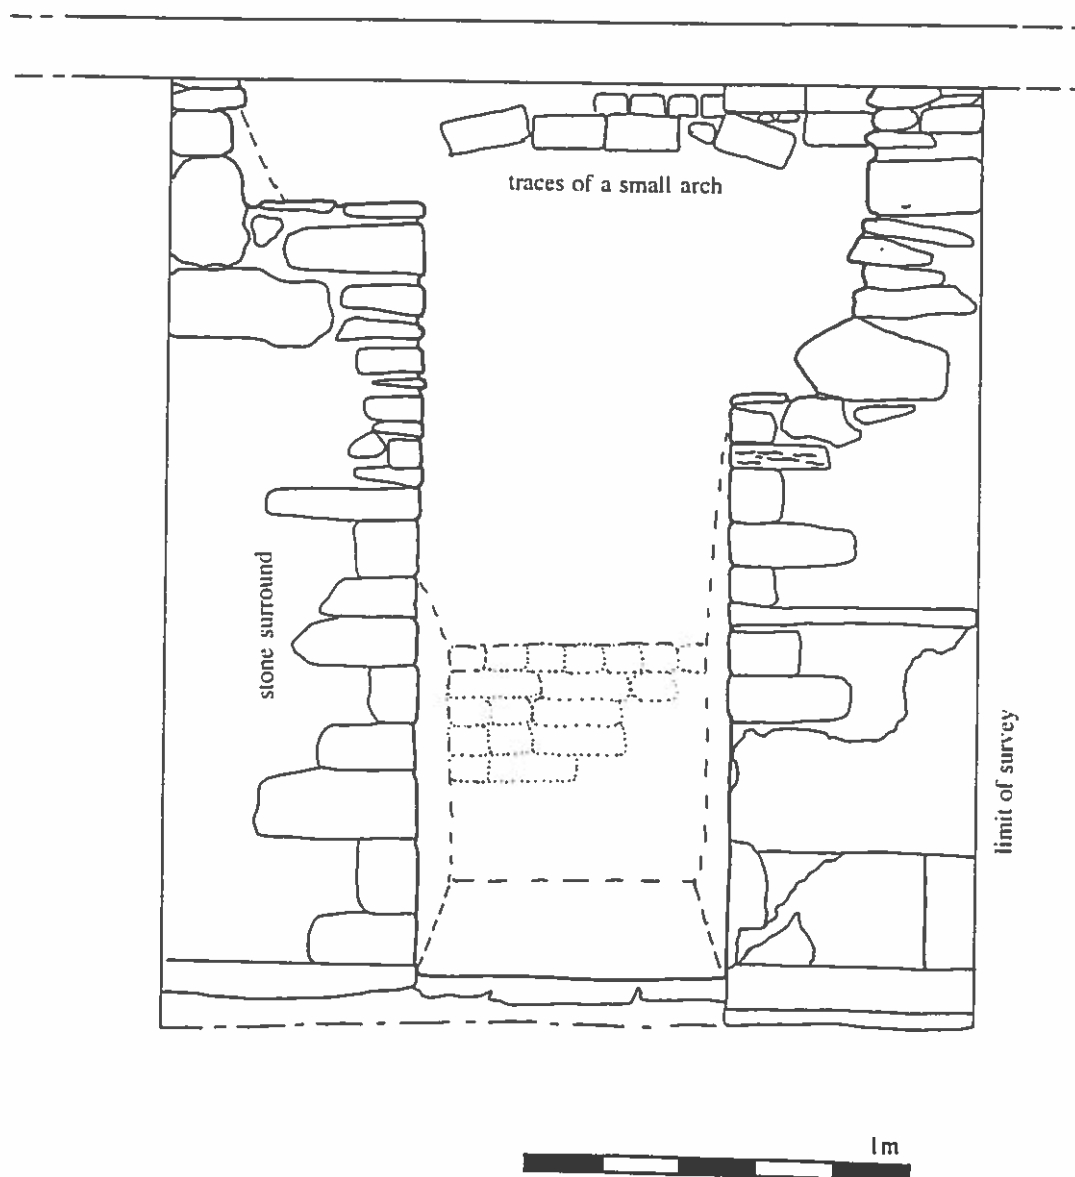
AREA C: WEST-FACING INTERNAL ELEVATION, BLOCKED-UP DOOR AND WINDOW OPENINGS
